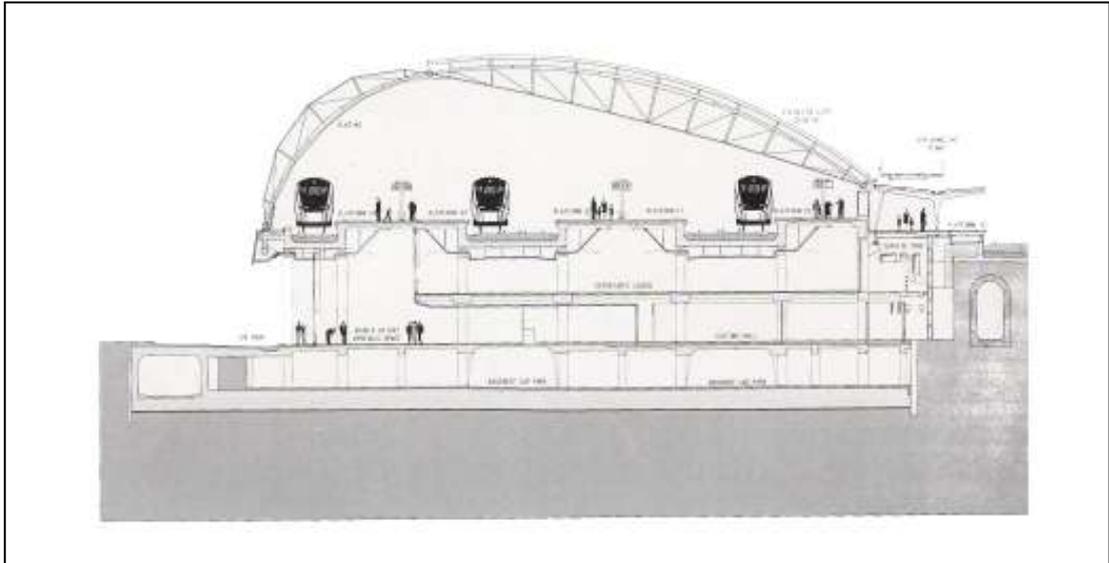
Cross-section of the Channel Tunnel Terminal Building in London, England (Source: Plank, 1993)
